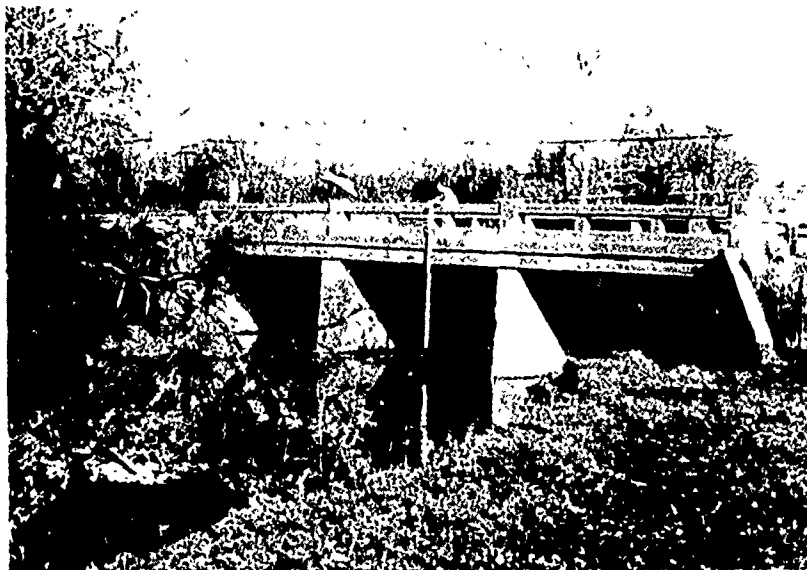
View of upstream face of State Route 534 bridge, looking downstream, at river mile 90.17.
